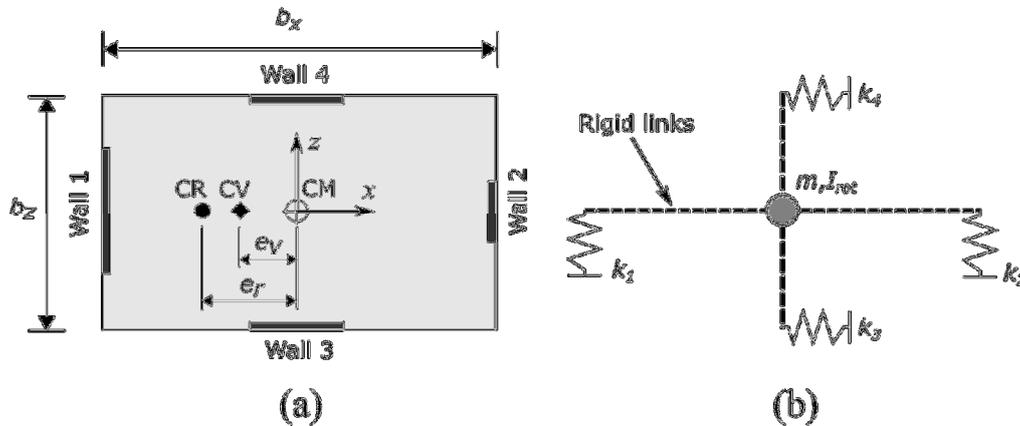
(a) Plan view of a RC wall building with an asymmetric configuration. (b) Numerical model of the building represented by an equivalent 2D system (adapted from [1]).
